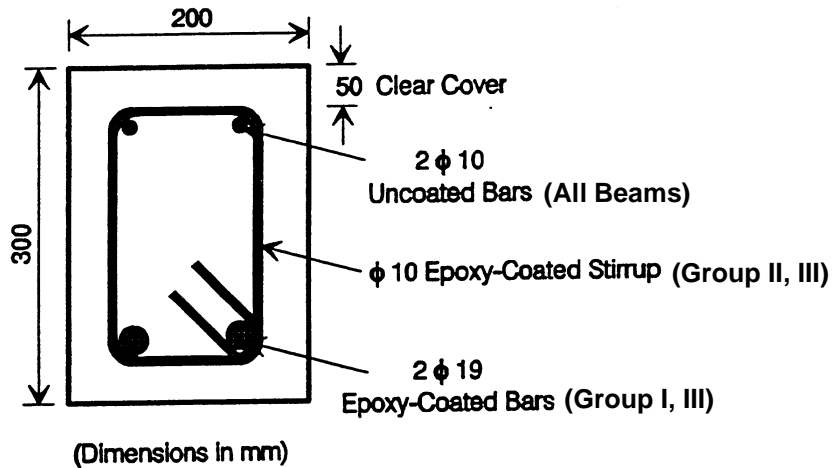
Cross-Section of the Beams and Bars Exposed.
